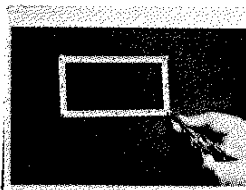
B: SCREW TEMPLATE IN WALL TO CUT MOUNTING HOLE.
